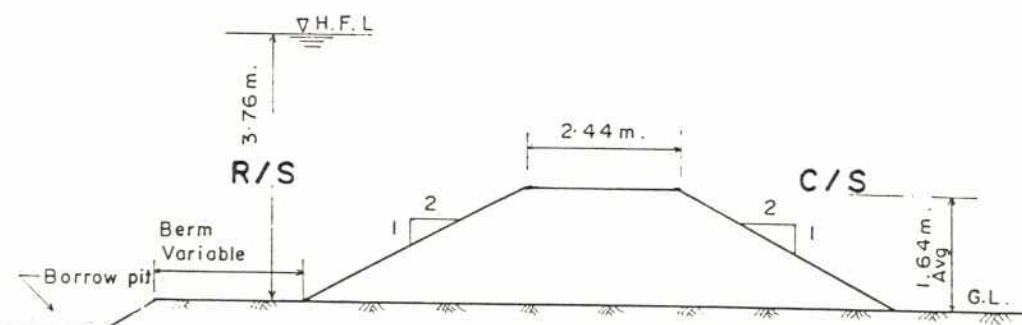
TYPICAL SUBMERSIBLE EMBANKMENT SECTION OF ZILKAR HAOR PROJECT
